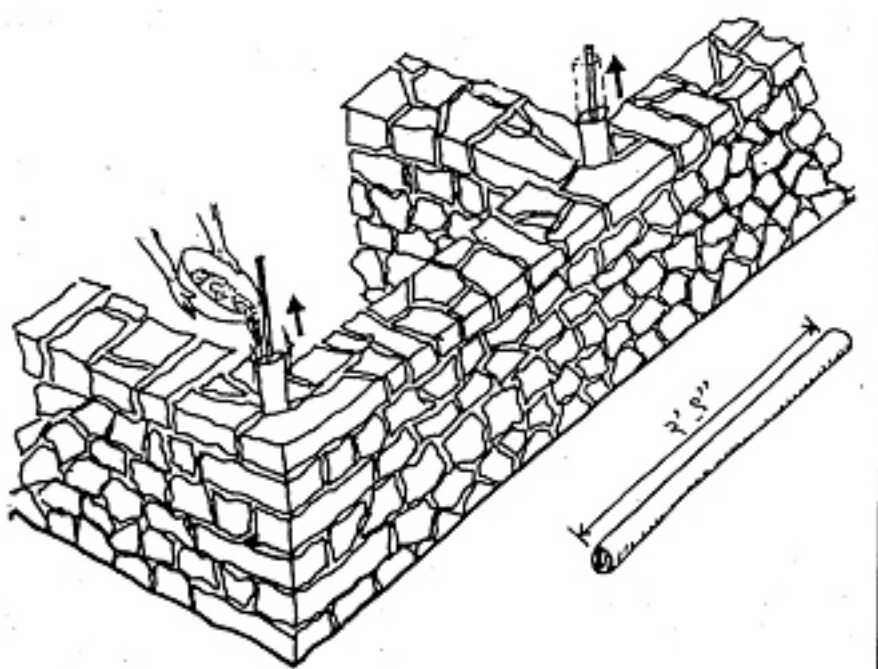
C: Seismic Strengthening - Installation of Vertical Bars at Wall Corners
